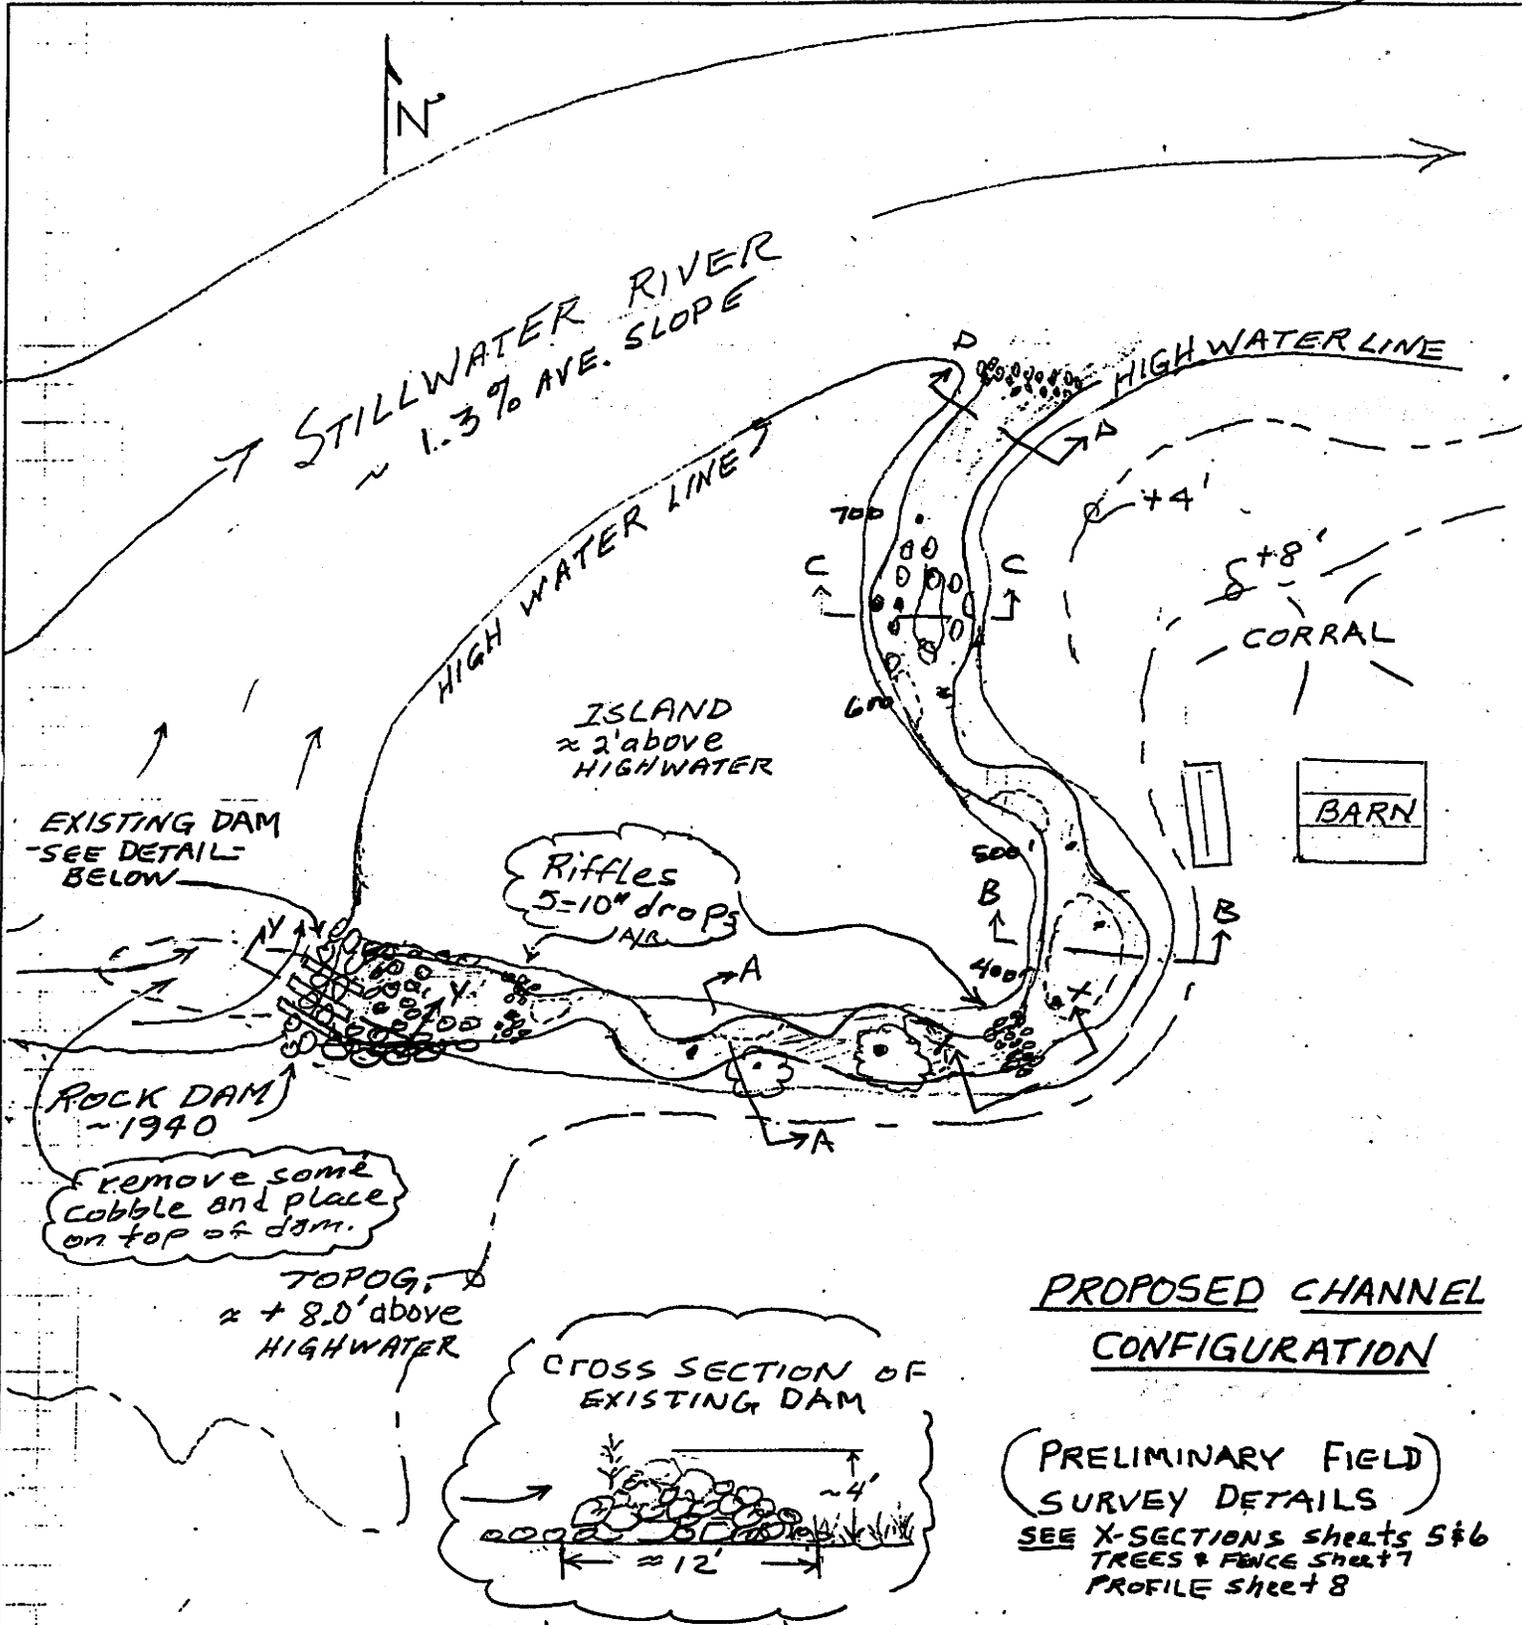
Plan View of Proposed Channel Configuration on the Stillwater River.
